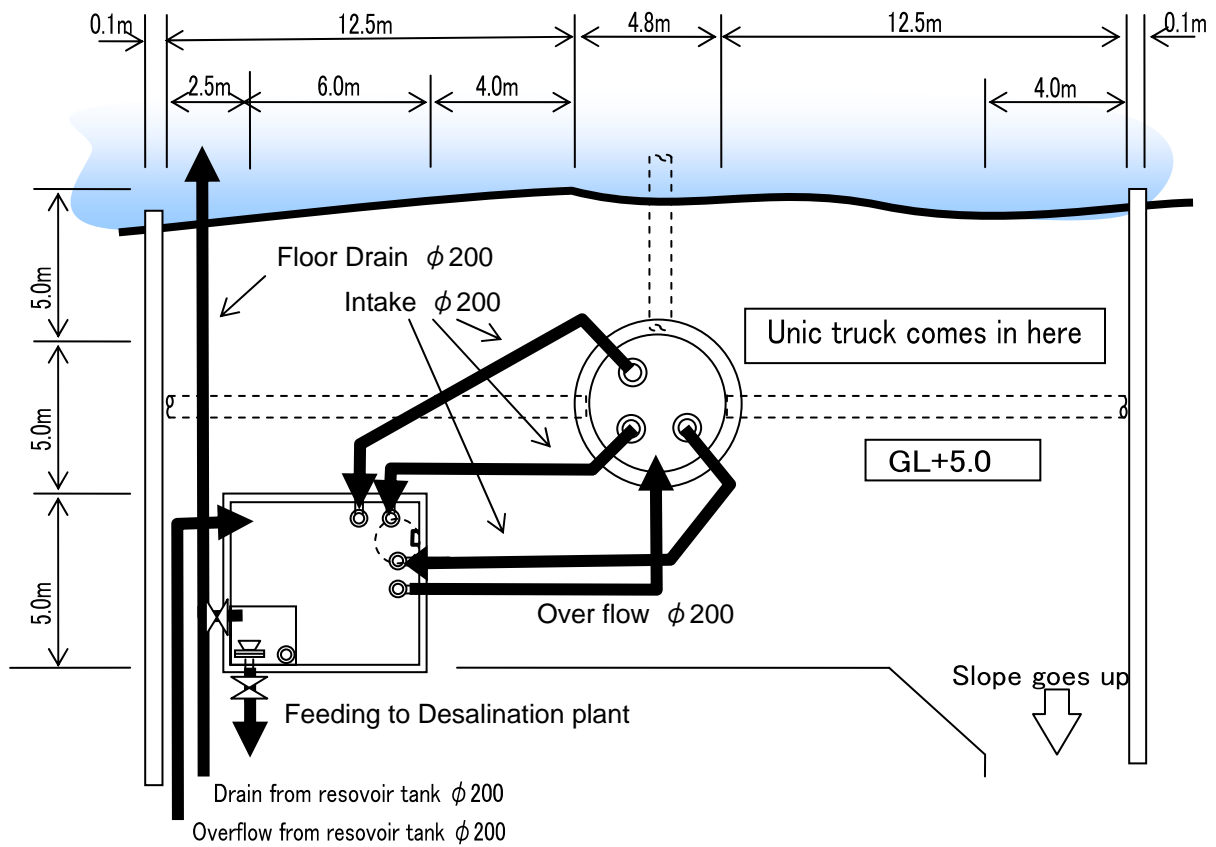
Layout Plan of Seawater Transmission Pipes
